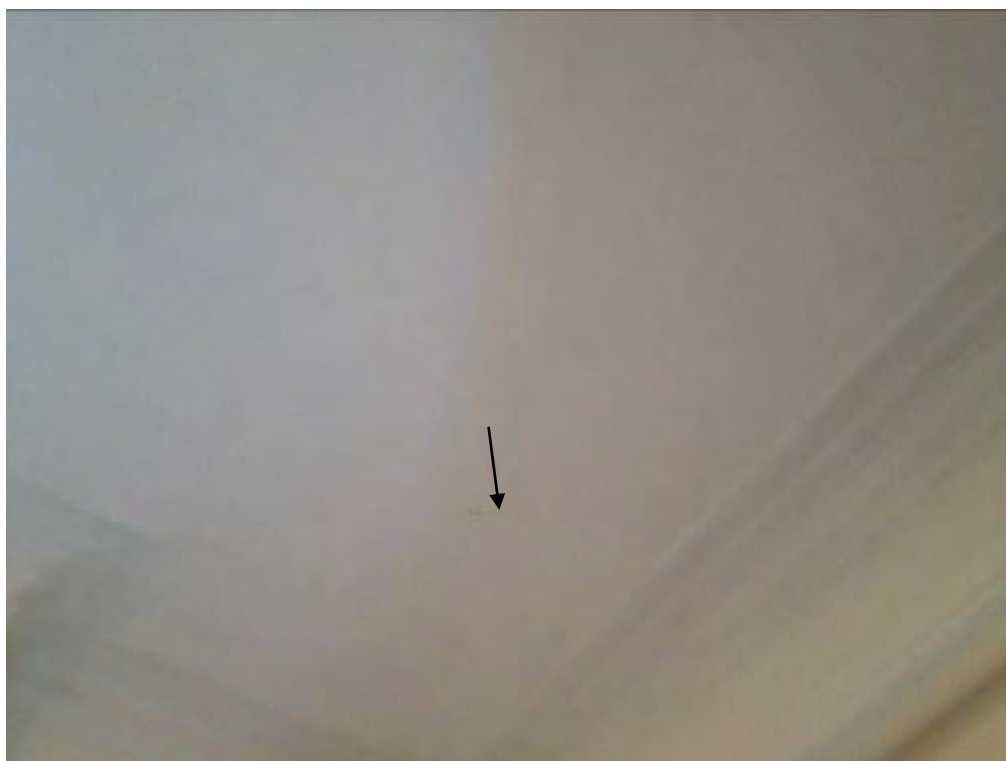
shows a hairline radial crack extending from the left hand side of Bedroom 1 door head towards the cornice
